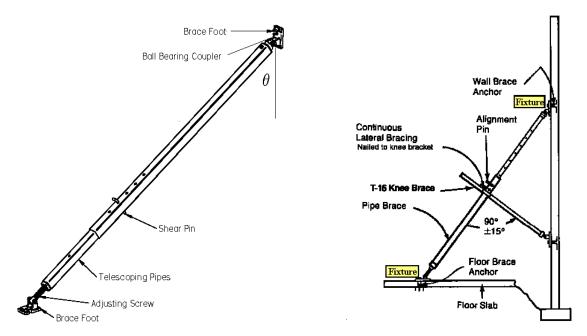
(a): Typical prop used on tilt-up panels Figure 1(b): Typical panel propping and bracing (*Tilt-up Precast Construction Handbook, March 2012*)
